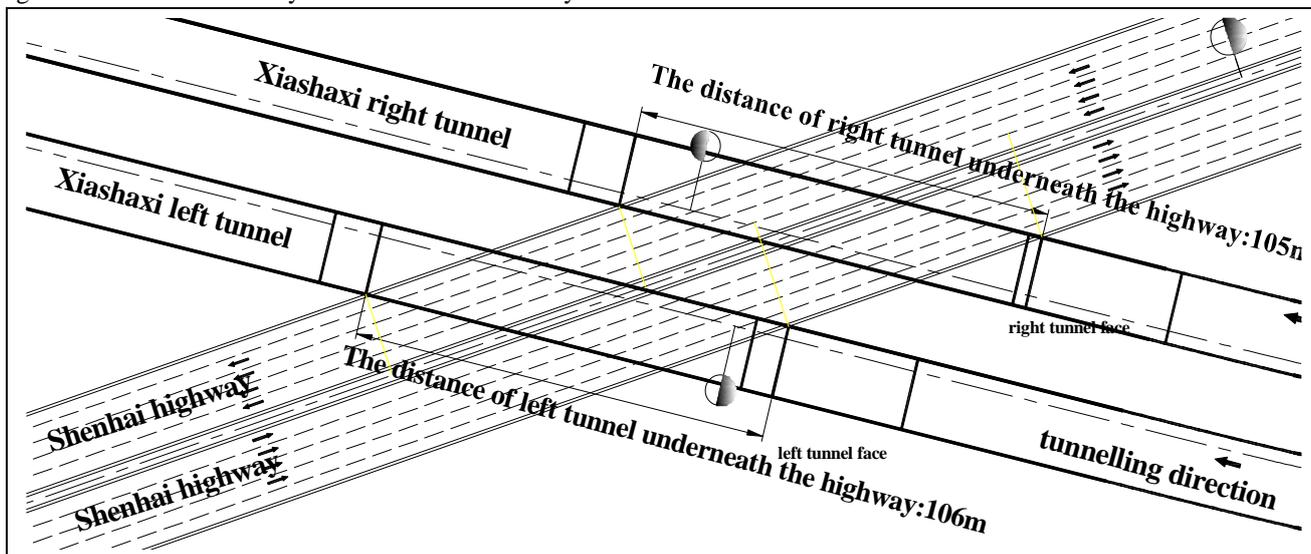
FIGURE I. PLAN VIEW OF XIASHAXI TUNNEL UNDERNEATH SHEN-HAI HIGHWAY.
